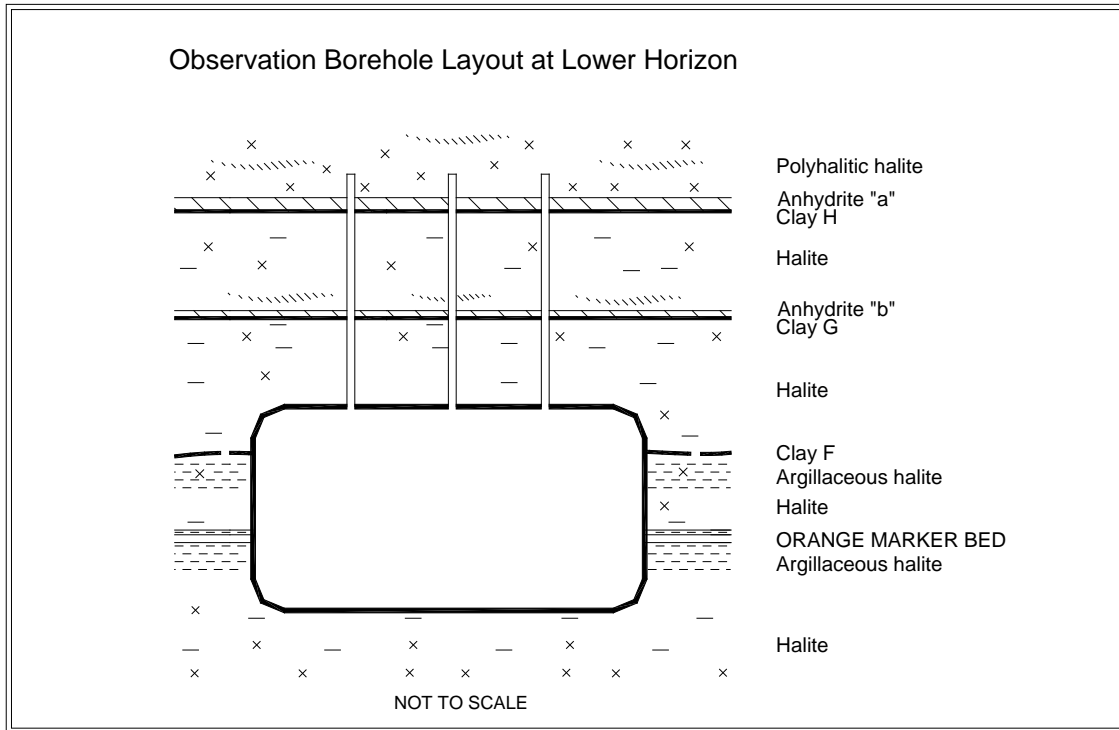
1 Example of Observation Hole Layout at Lower Horizon
